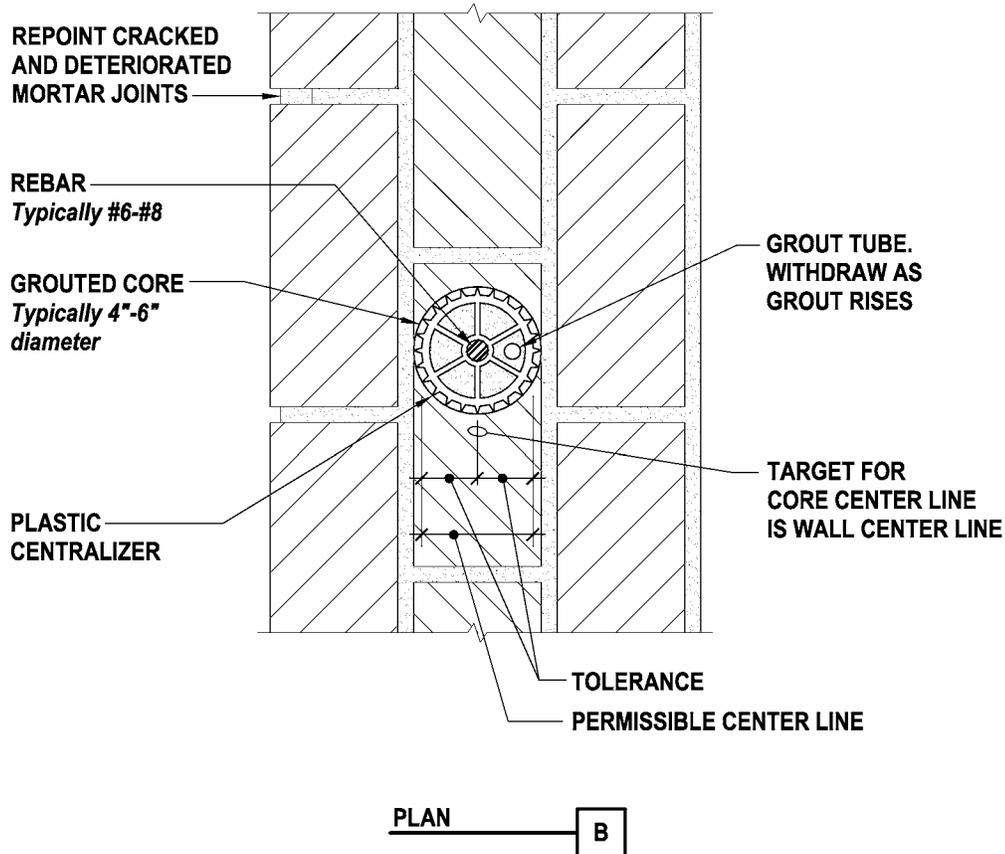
B: Plan Detail of Reinforced Core in Masonry Wall
